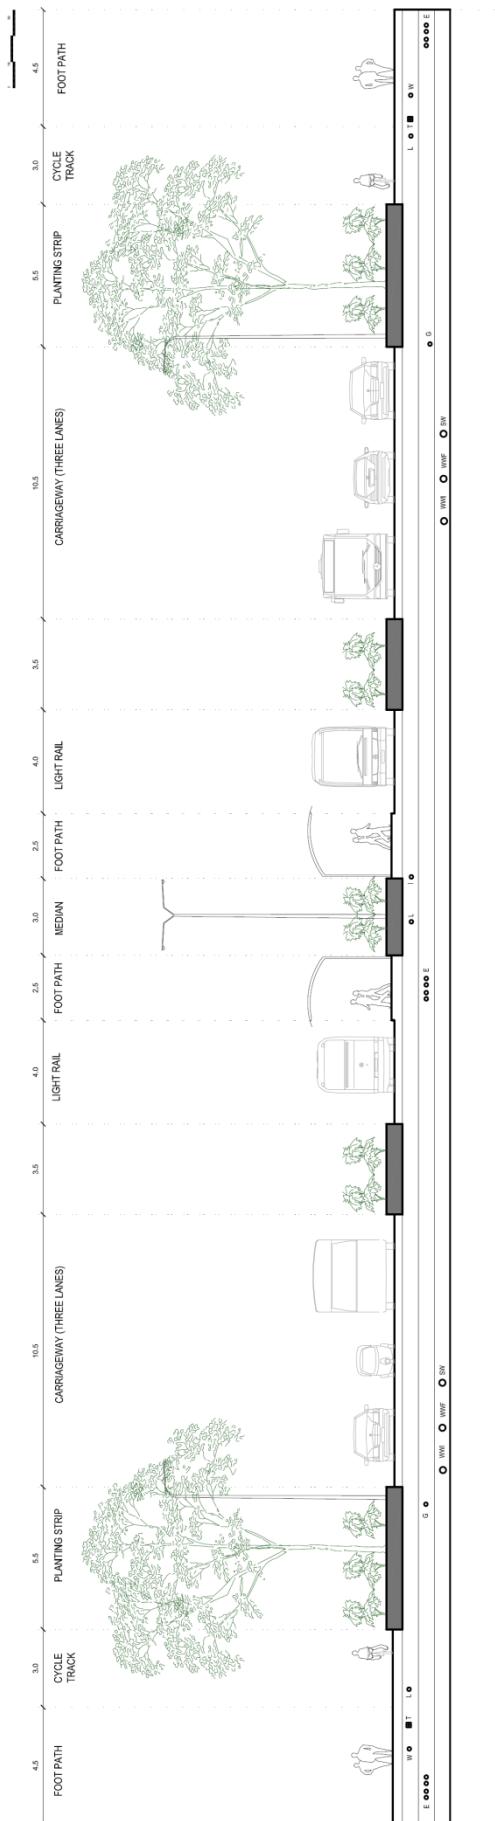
Road Cross Section - Industrial Priority Arterial Road
